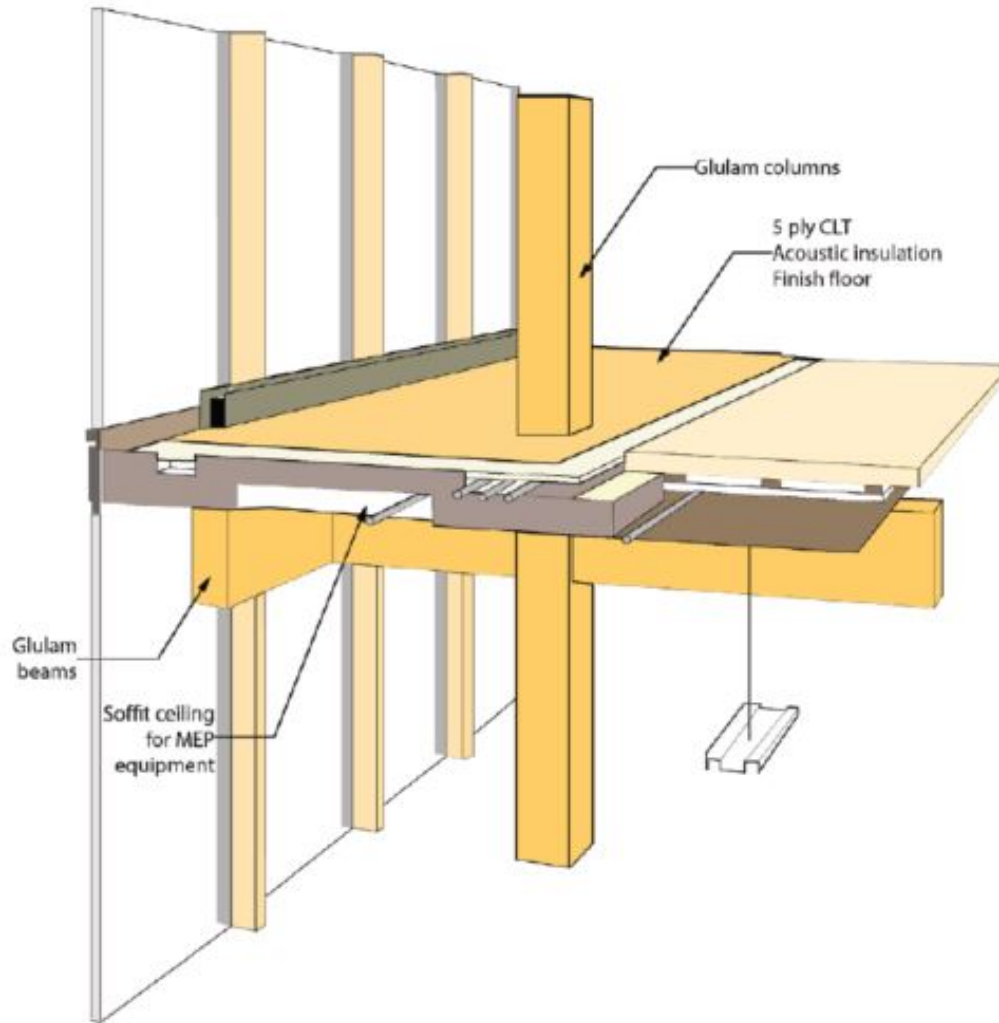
Structural diagram illustrating the modular construction of CLT systems. (Source: Author)
